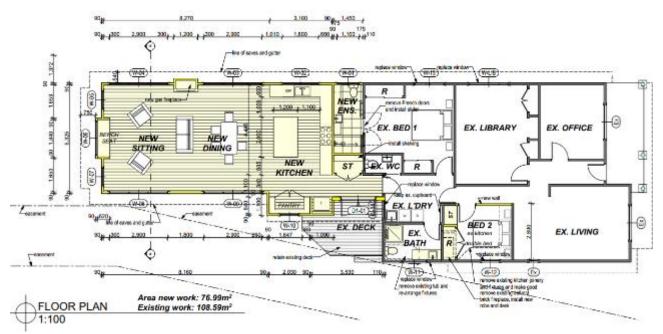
Proposed floor plan. Source: Coble Stephens Architects, 14.08.2024.
